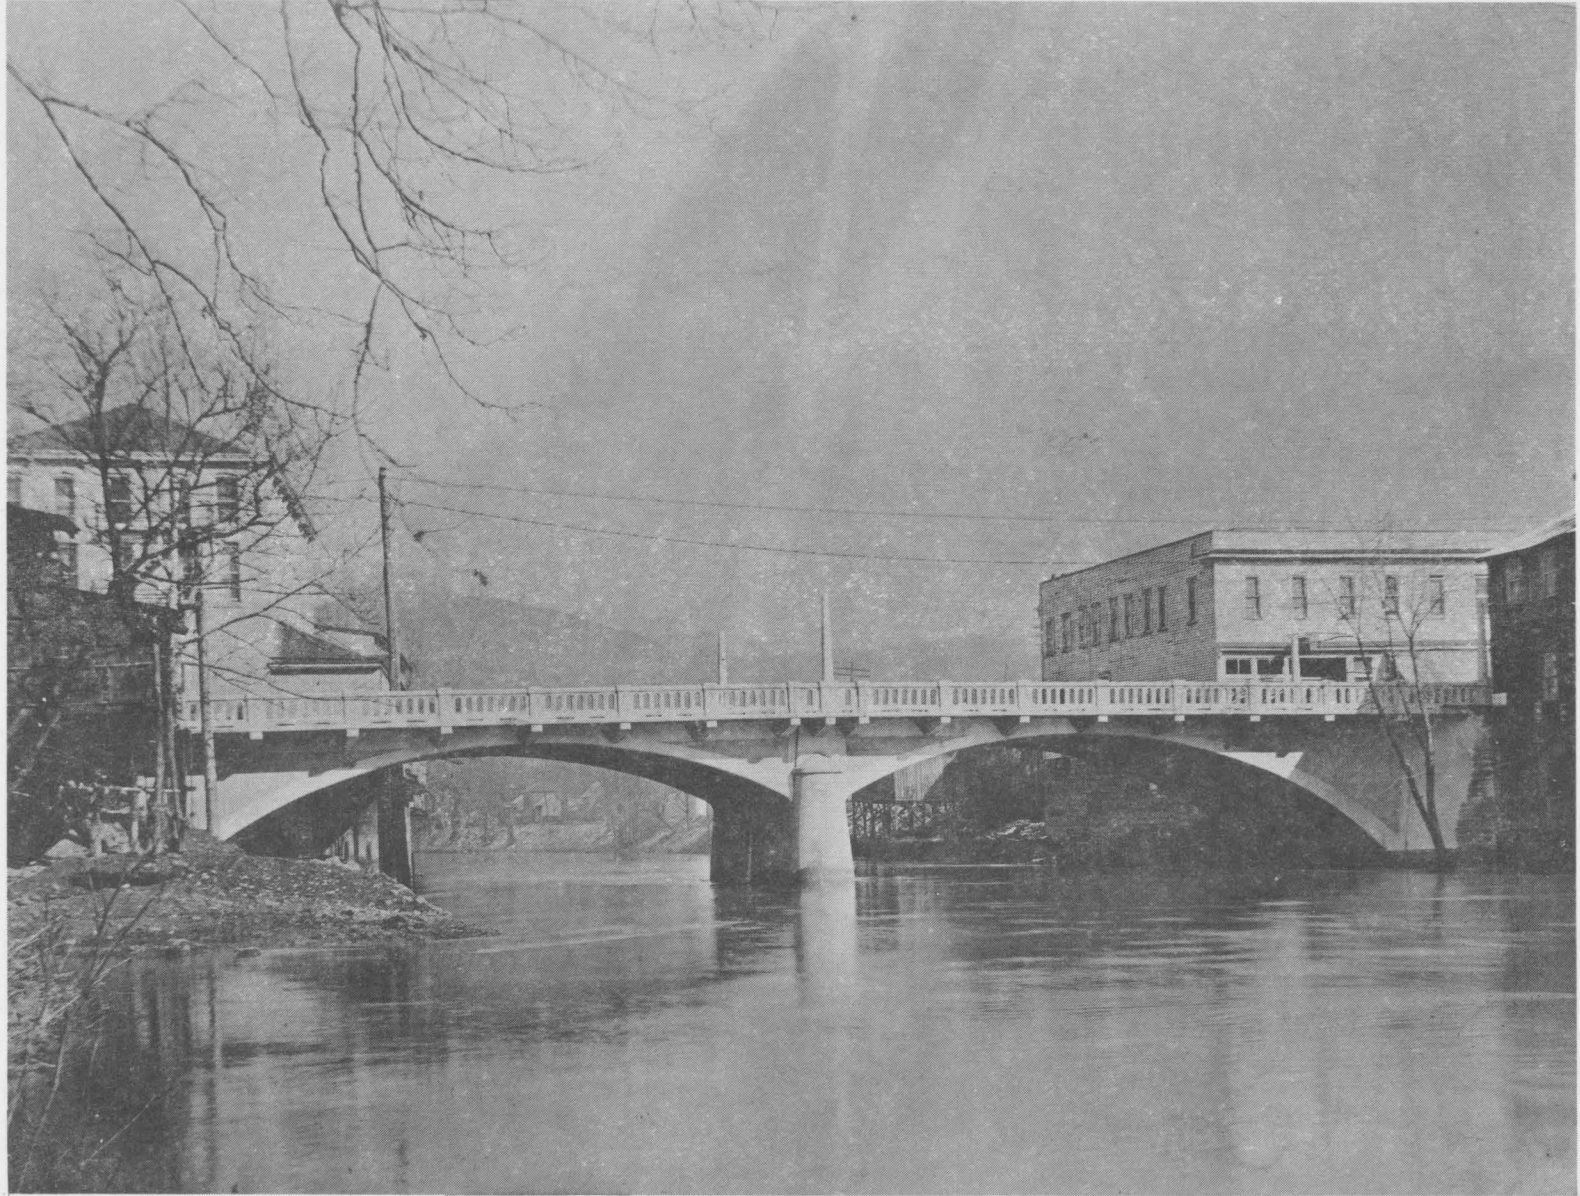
McEnteer's Weston Bridge - McEnteer Collection
